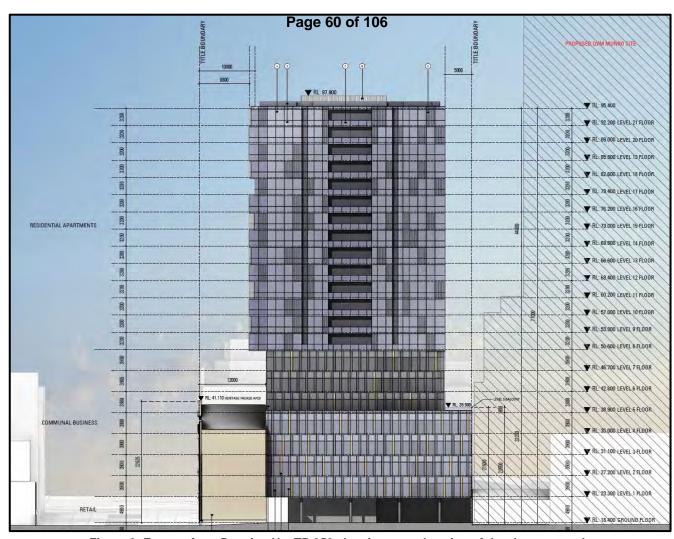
Excerpt from Drawing No. TP-350 showing east elevation of development and relationship between retained historic building and contemporary tower form behind
